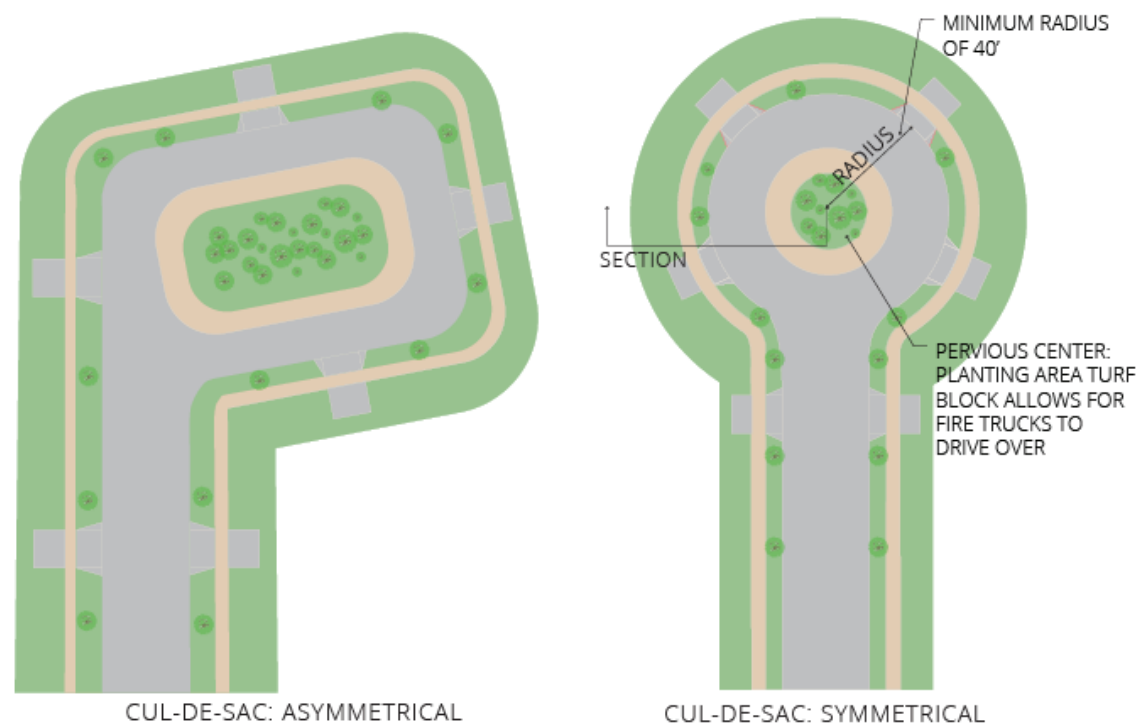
GREEN INFRASTRUCTURE FOR CUL-DE-SAC PLAN VIEW
